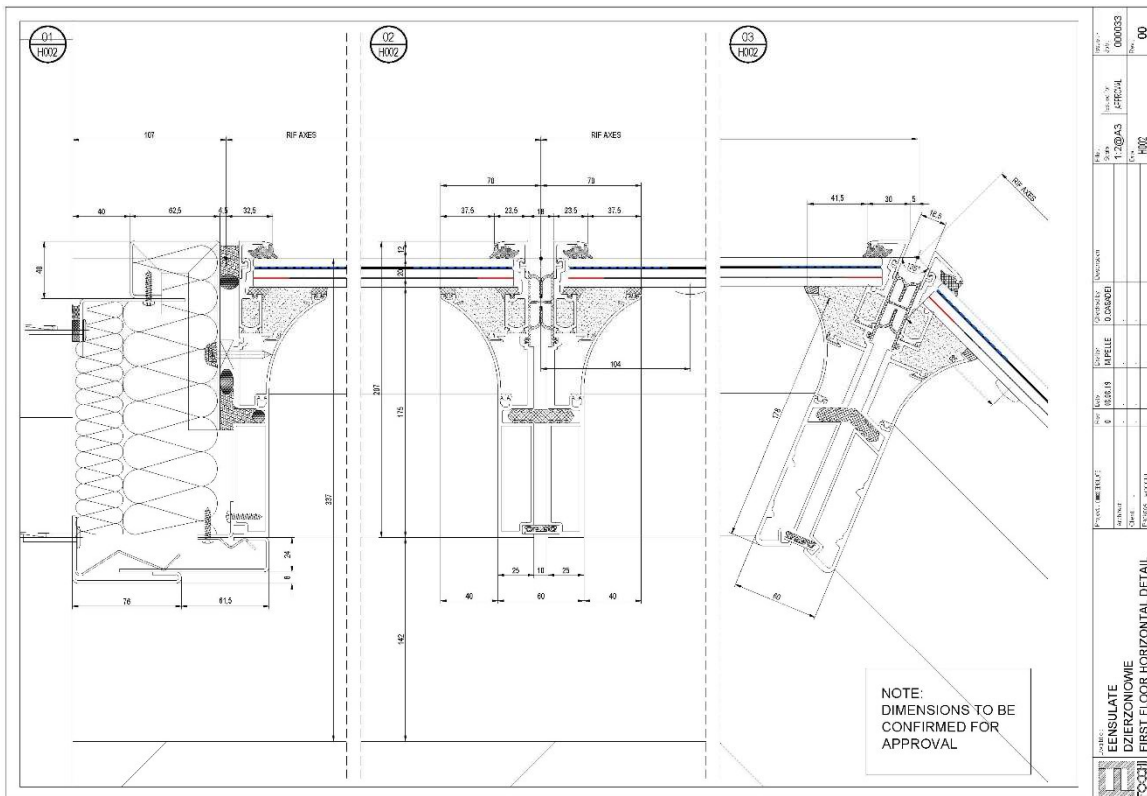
Polish Primary School: Curtain wall detail 2 (first floor horizontal detail)
